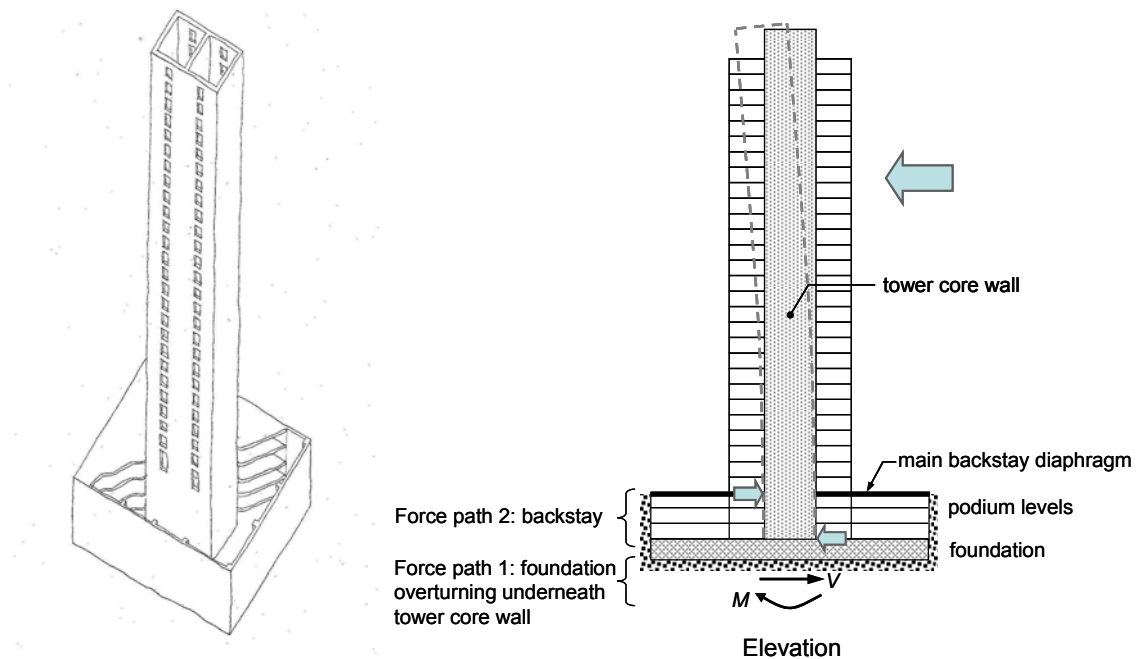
Example of a tall building structural system with a concrete core wall superstructure and below-grade perimeter retaining walls forming a podium.
